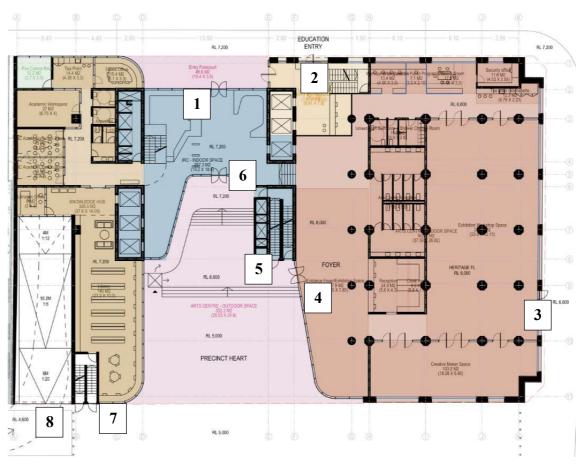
Excerpt from latest architectural plans with entrances/exits marked (BVN, 2021)
